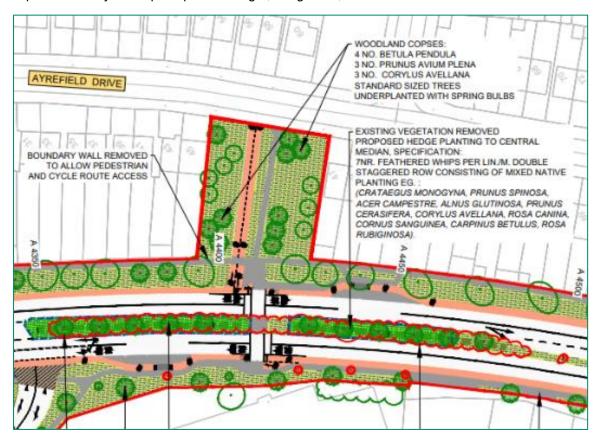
Extract from Landscaping General Arrangement Drawings showing proposed planting
